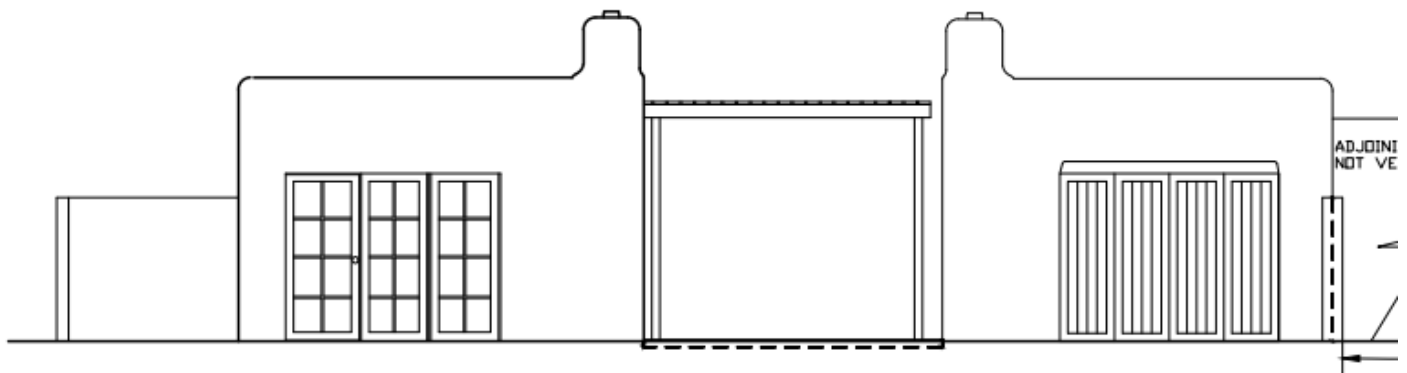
East Elevation of Casita with Pergola and Garage with New Doors as Proposed.
